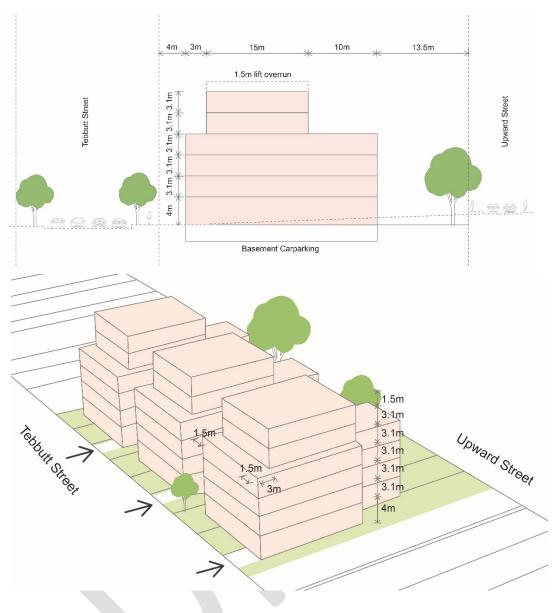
Tebbutt and Upward Streets – storeys, building envelope, scale and site layout – section and axonometric
